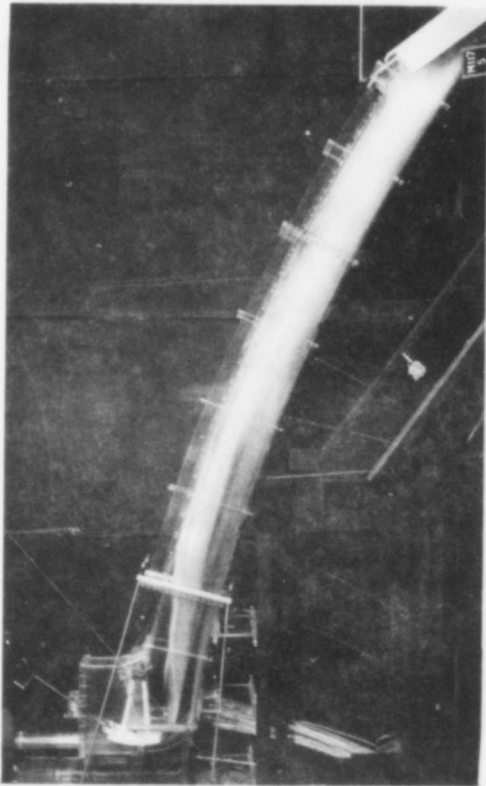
Fluctuating nappe along right wall of plan D-1 spillway chute. Top of wall is indicated by the black line. Free flow, 181,000 cfs, pool elevation 1,604.9.
